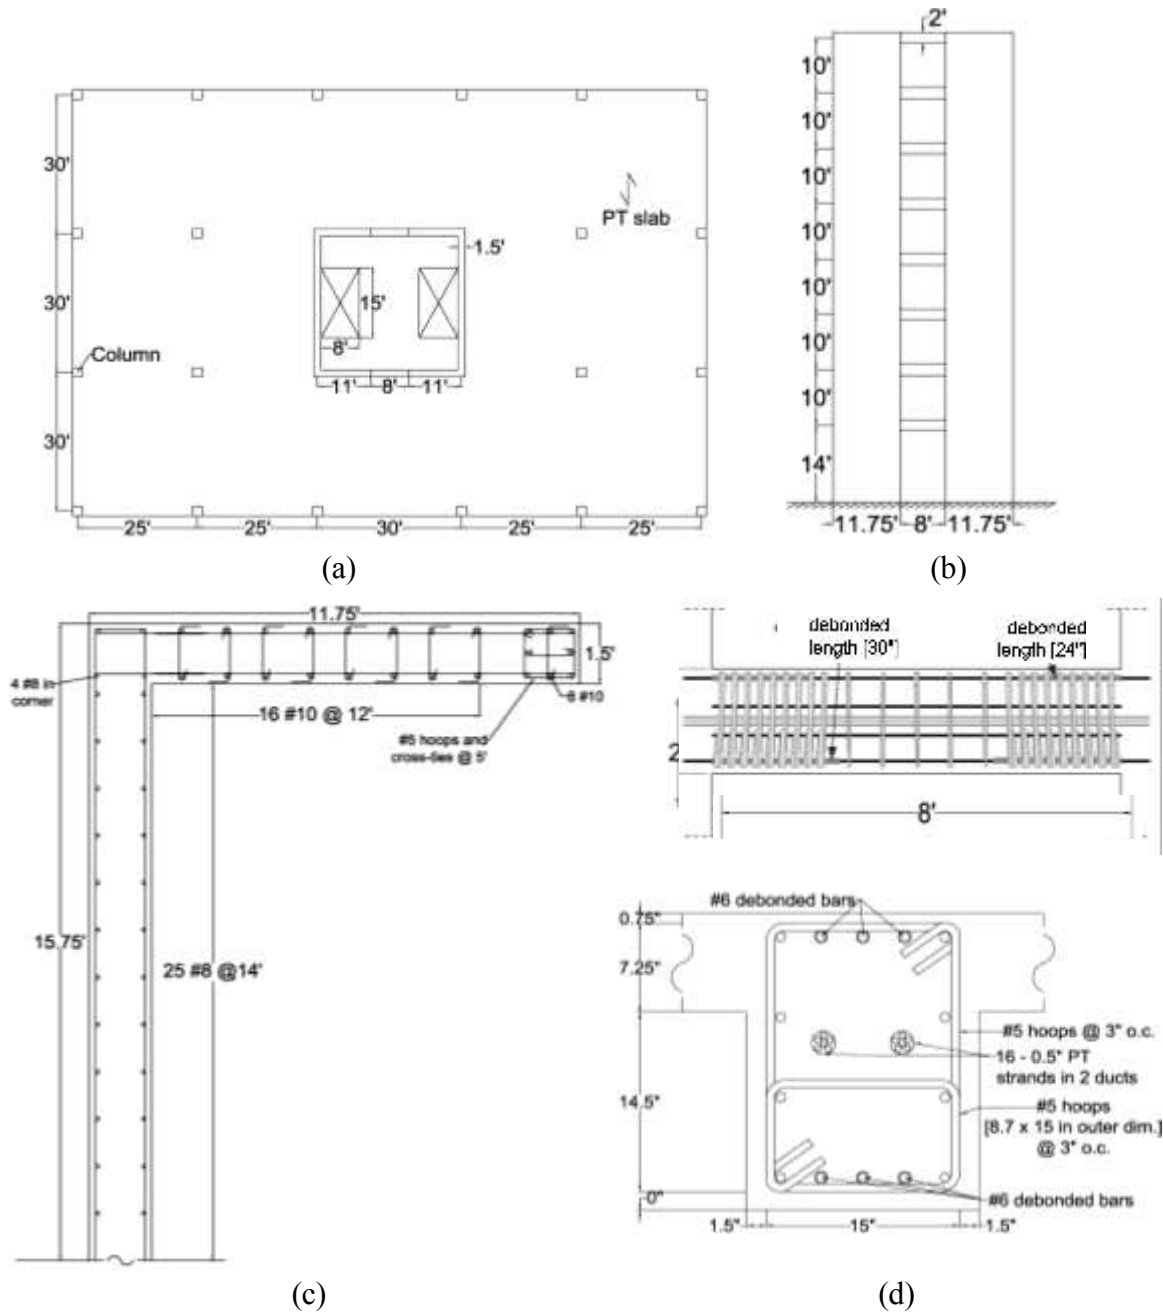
Prototype structure: (a) building plan; (b) building elevation; (c) wall base details; (d) coupling beam details
